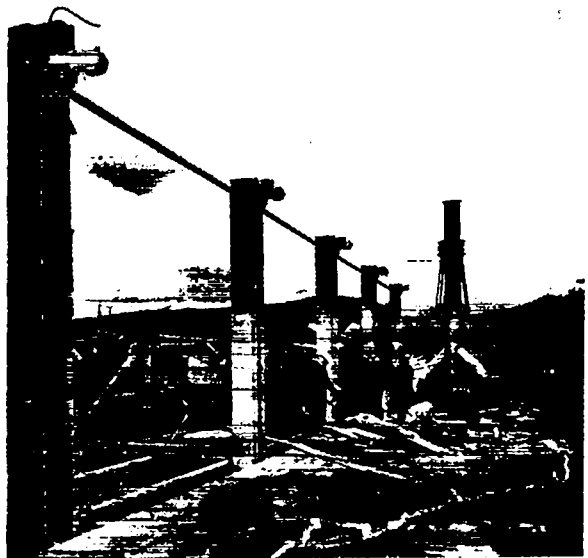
Roof-level view of penthouse area, after removal of most of the walls and roof.
